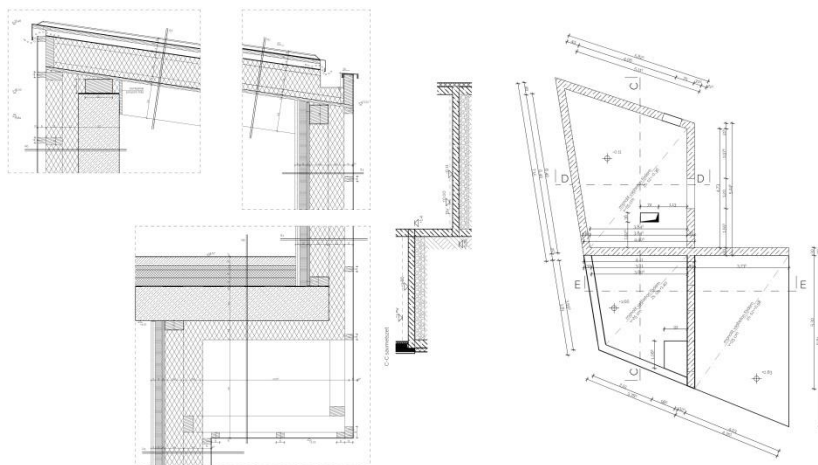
a) Detailed plan of the joints and b) formwork plan of a single-family house [19]
